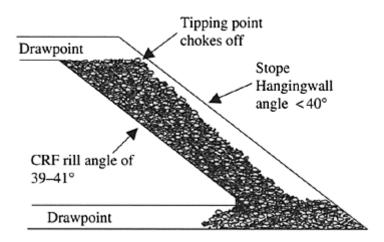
Section through a stope showing rill angles of backfill compared to stope hangingwall angle.
